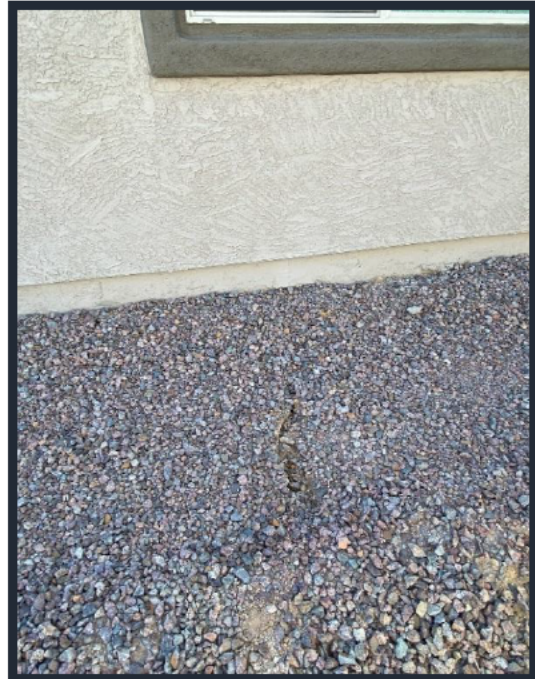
Lot 19, cracks observed in the soil on the west side of house
